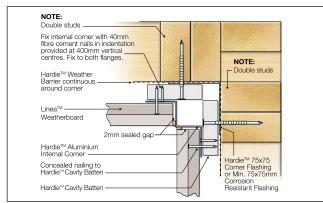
INTERNAL CORNER MOULD DETAIL
